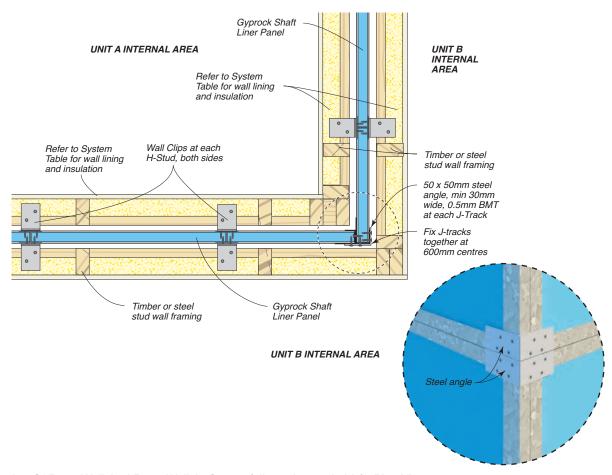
Junction Of Party Wall And Party Wall At Corner (clip on internal side)- Plan View
